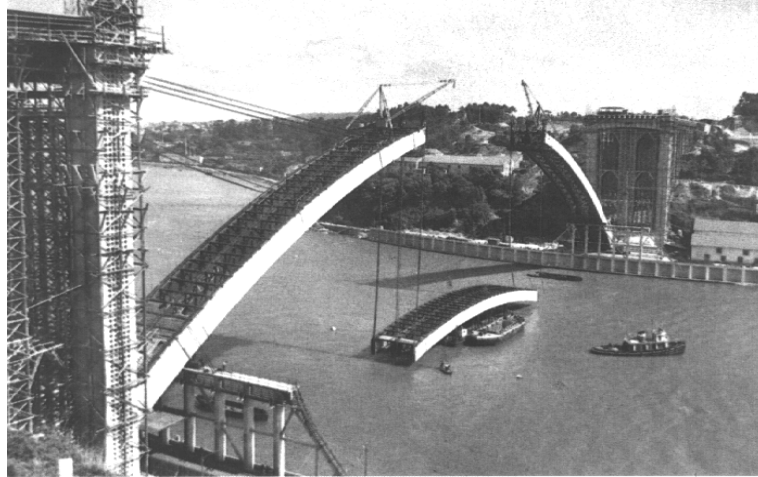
Arrábida Bridge – positioning of the metallic falseworking (Azeredo 1998).
